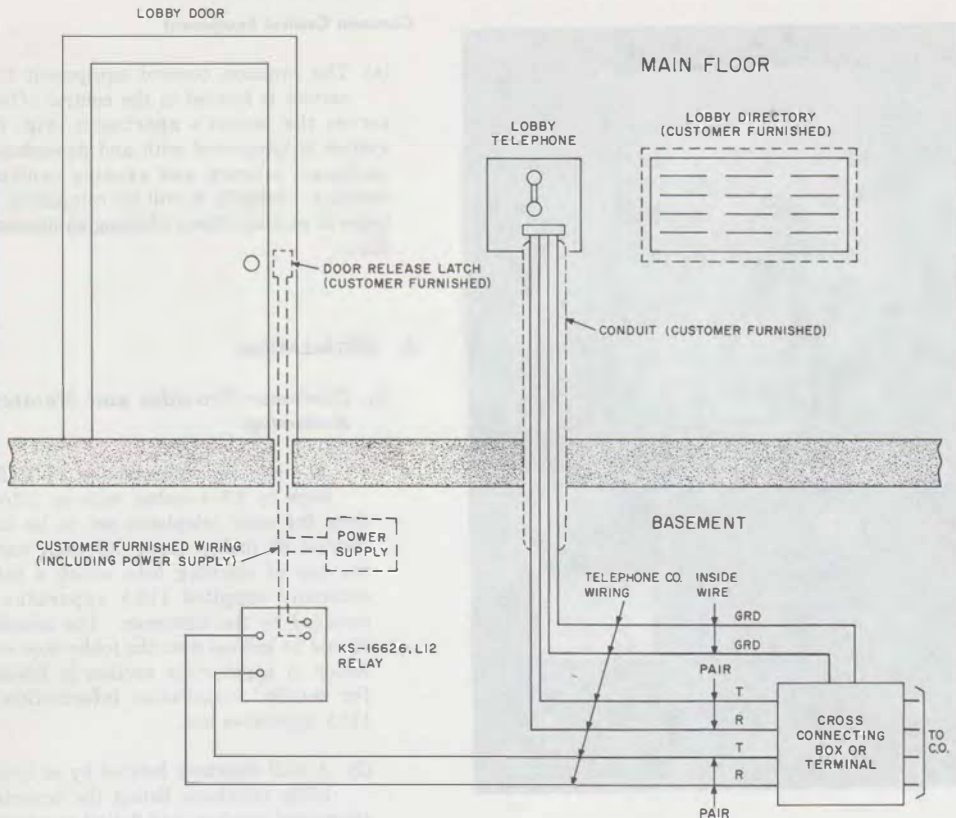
Typical Installation of 2755A (Apartment Building) Telephone Set
